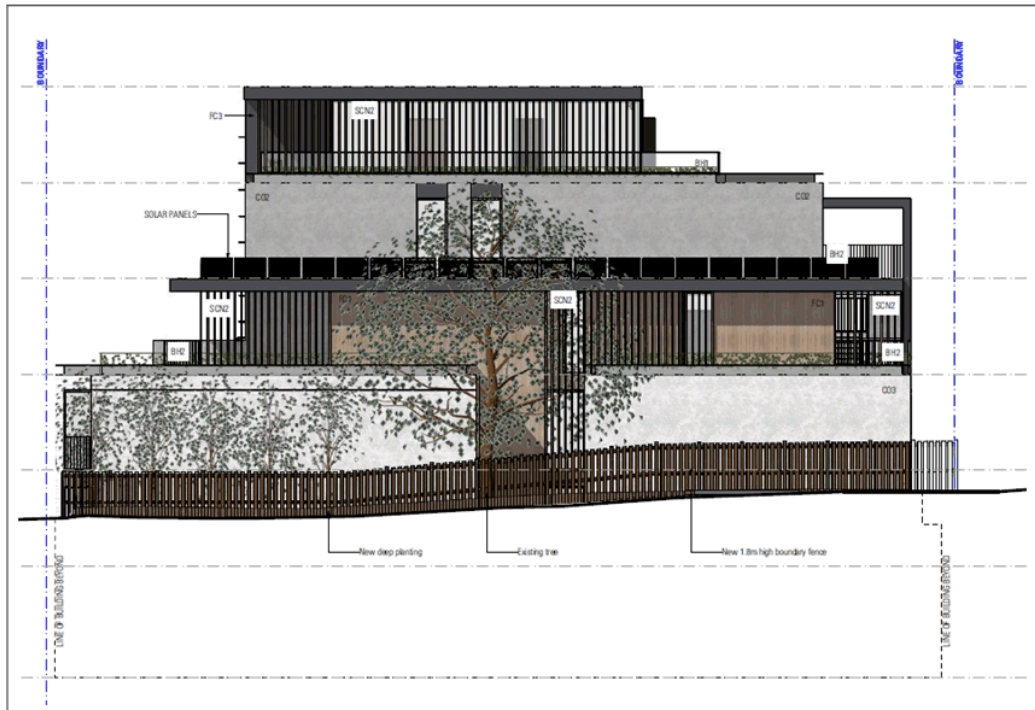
Northwest rear elevation (Source: JAWS Architects)
